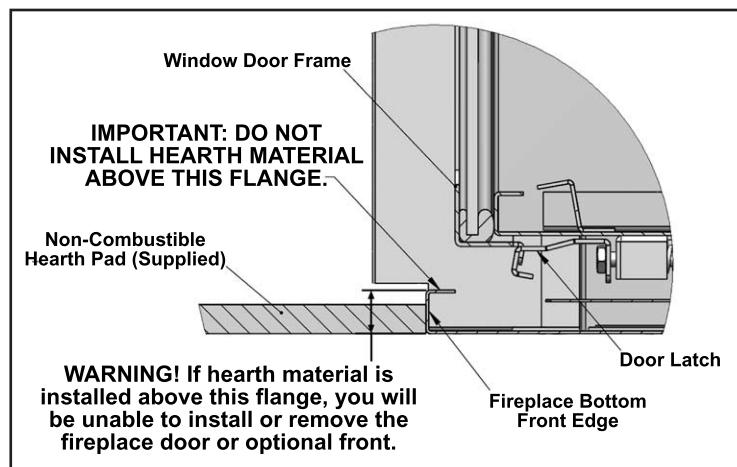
Fireplace Section for a Raised Hearth - WARNING.
